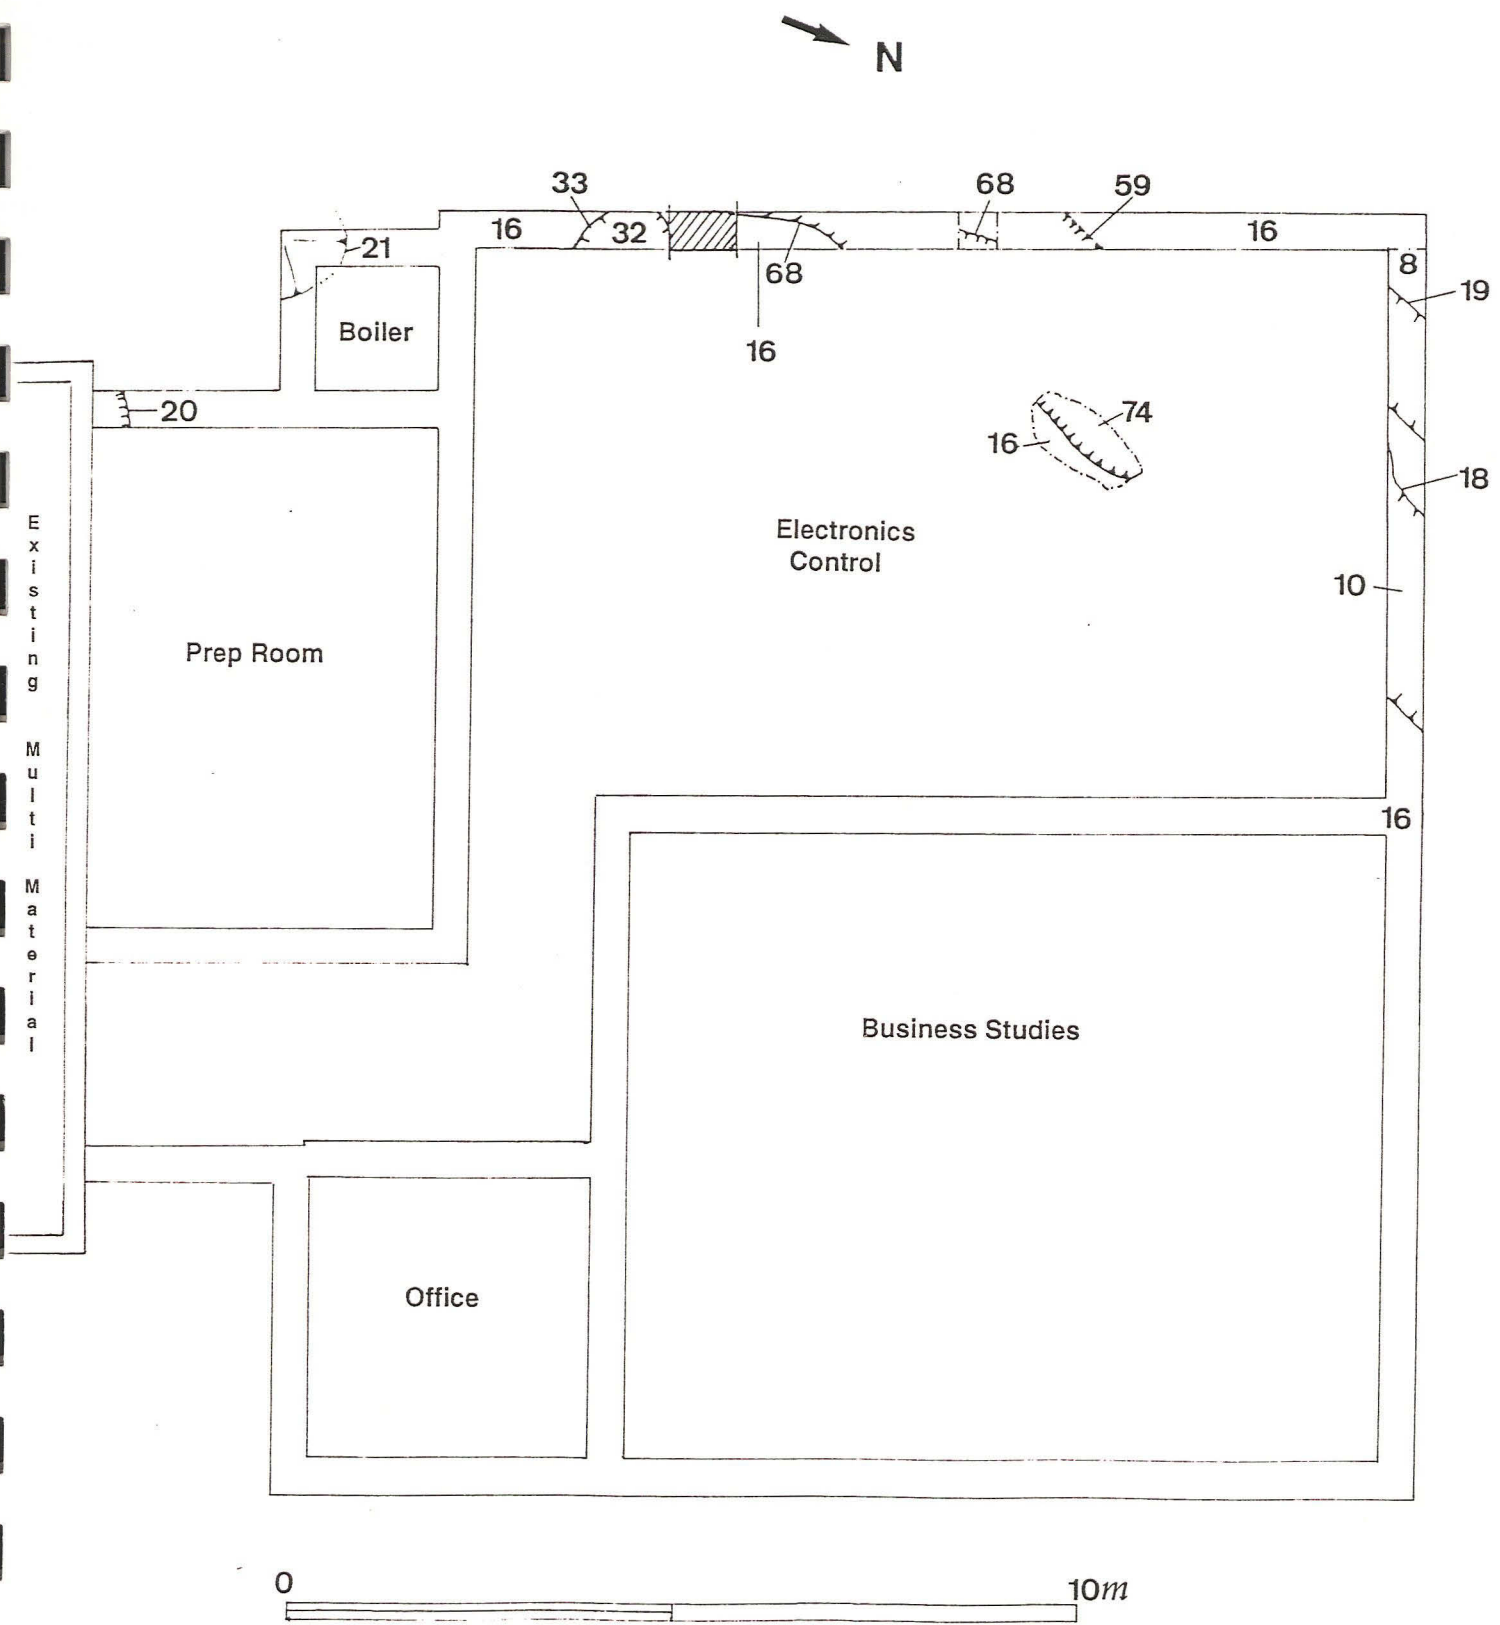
Plan of the Foundation Trenches, showing the Positions of Archaeological Features (McDaid, after plans supplied by the architect)
